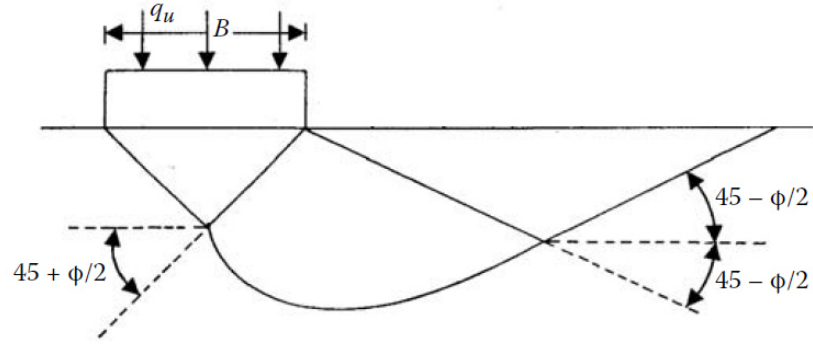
Modified failure surface in soil supporting a shallow foundation at ultimate load.
